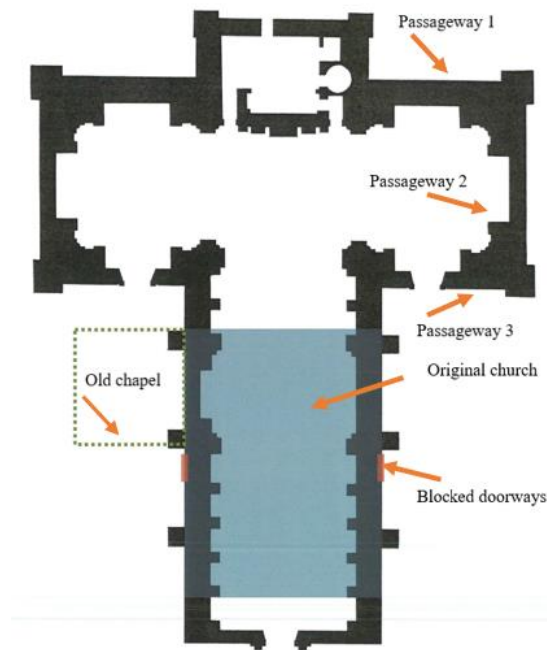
Architectural plan of San Girgor showing location of original 15<sup>th</sup>-century church (in blue), old chapel (dotted line), blocked doorways (in red) and the three hidden rooftop passageways (marked with red arrows). Plan adapted from Abela (2006) and Abela (2014).
